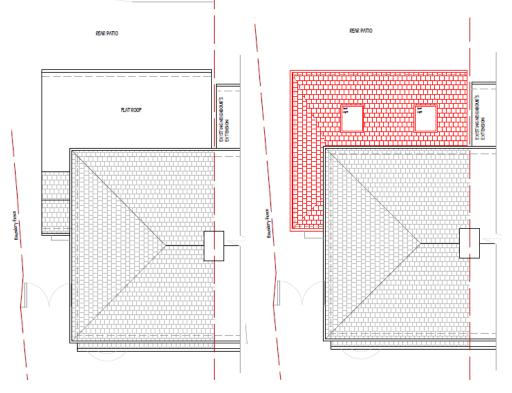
Existing(left) and proposed(right) roof at 44 Heath Road
